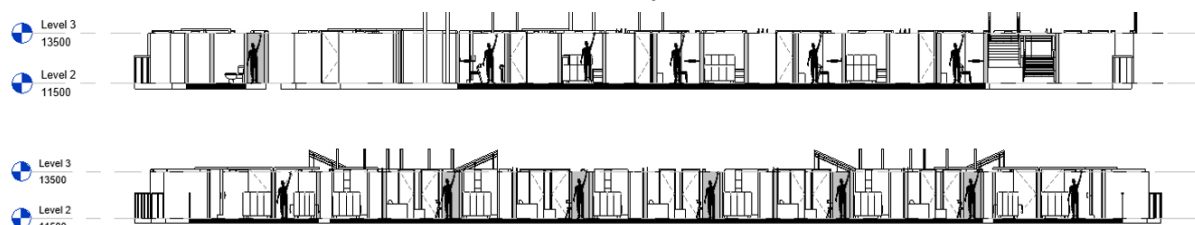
Section of Floor Height in The Jarrdin Apartment Residential Units
